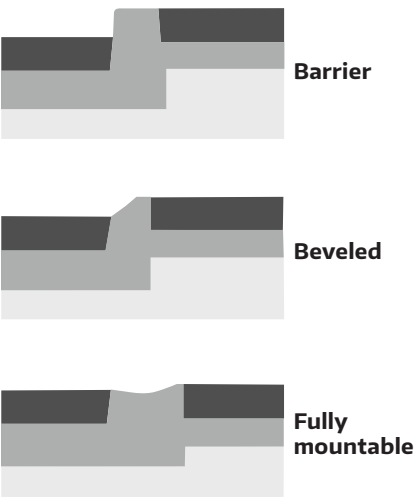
Curb types between cycle tracks and roadway or sidewalk.
